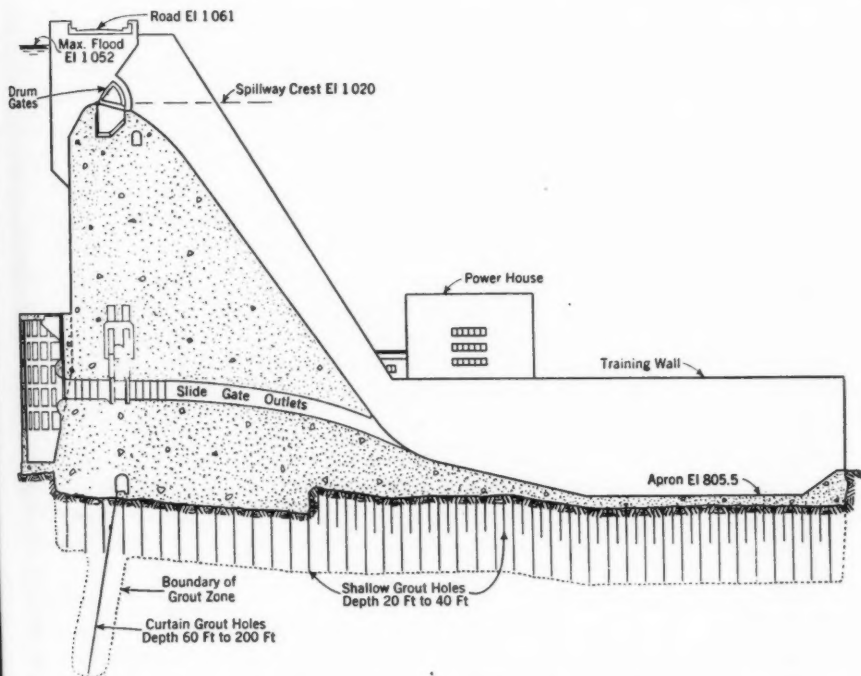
SECTION THROUGH SPILLWAY AND SLIDE GATE OUTLETS SHOWING FOUNDATION GROUT HOLES
